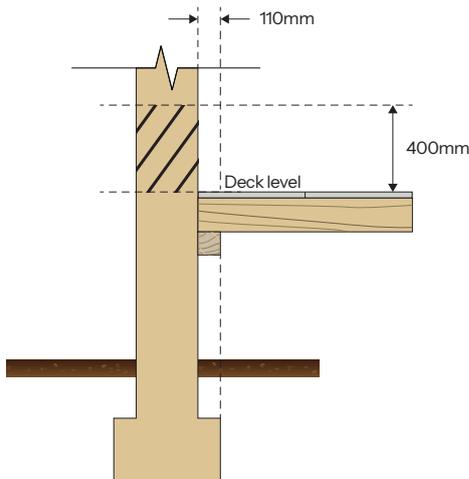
Construction requirements for external walls, glazing or door joinery within 400mm of deck level
